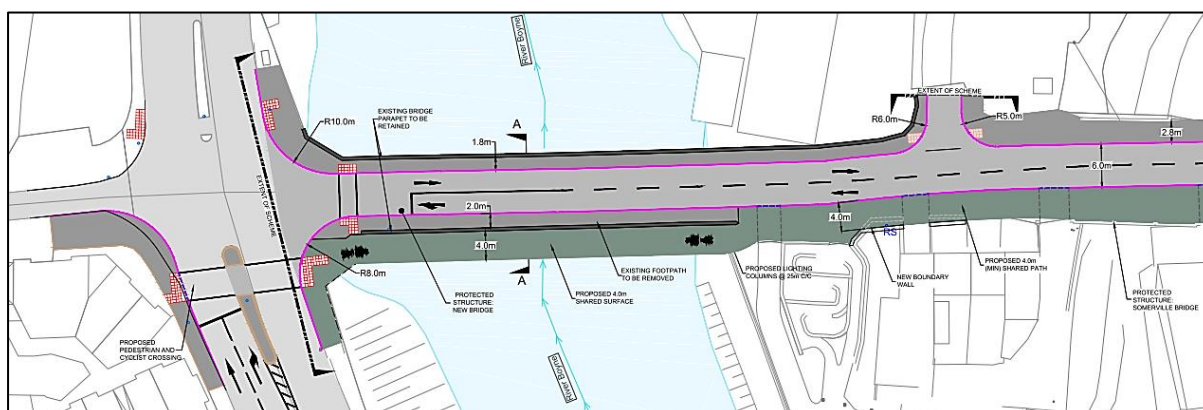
Pedestrian / Cyclists Bridge at New Bridge, Kentstown Road (R153).
